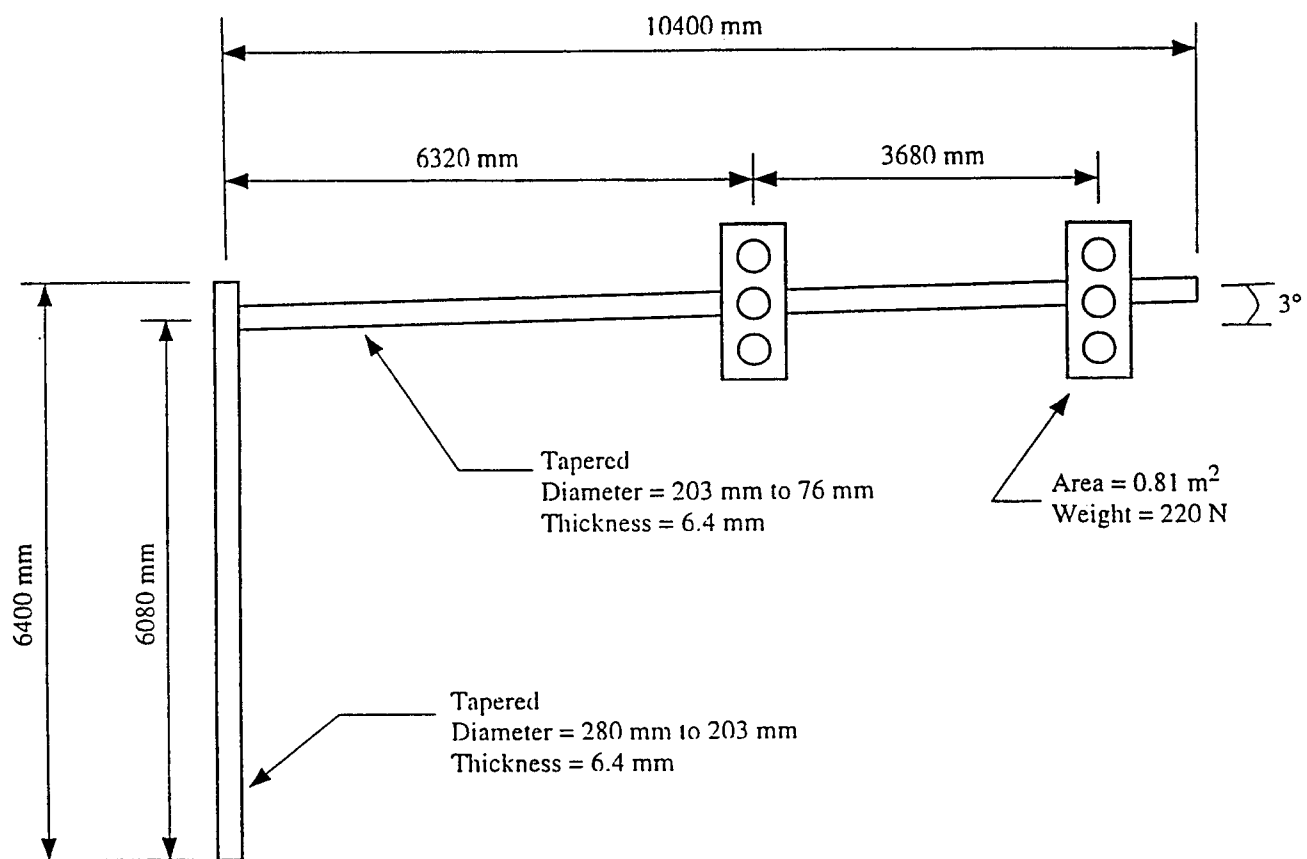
Details of Full-Scale Cantilevered Signal Support Structure (Signal Support #1)
